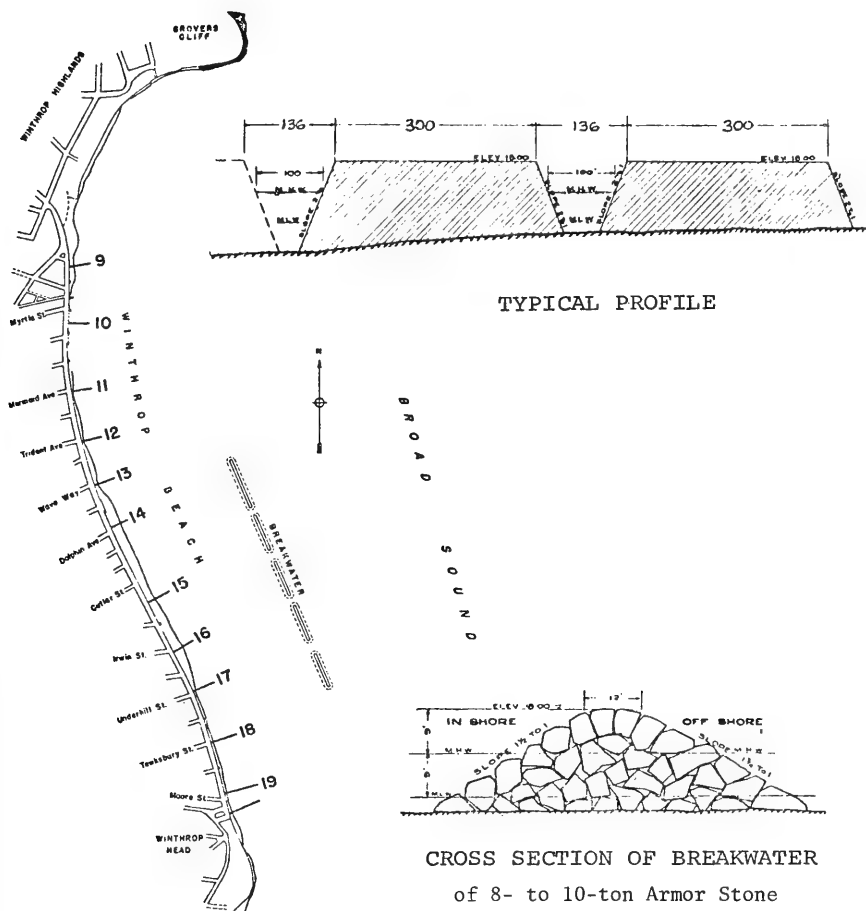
General plan and location of survey profiles. Comparative profiles shown in Figures 39 and 40 (Massachusetts Department of Public Works, 1933).
